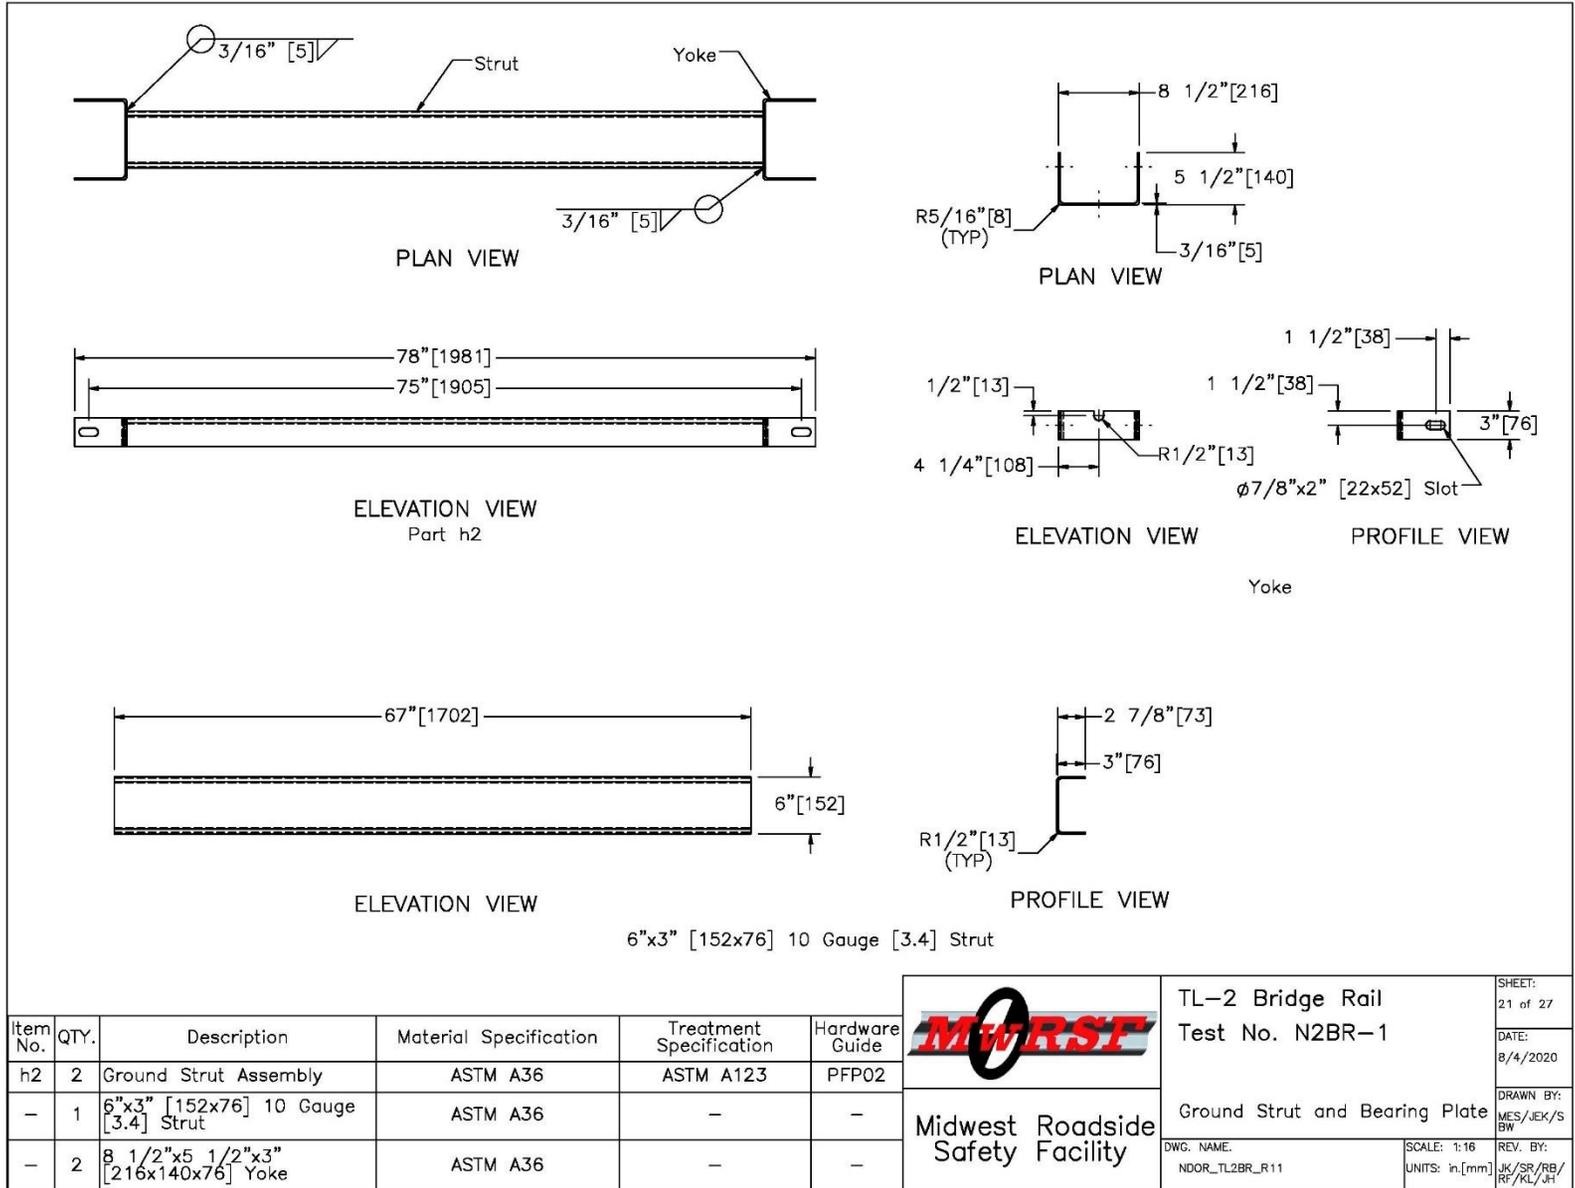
Ground Strut and Bearing Plate, Test No. N2BR-1
